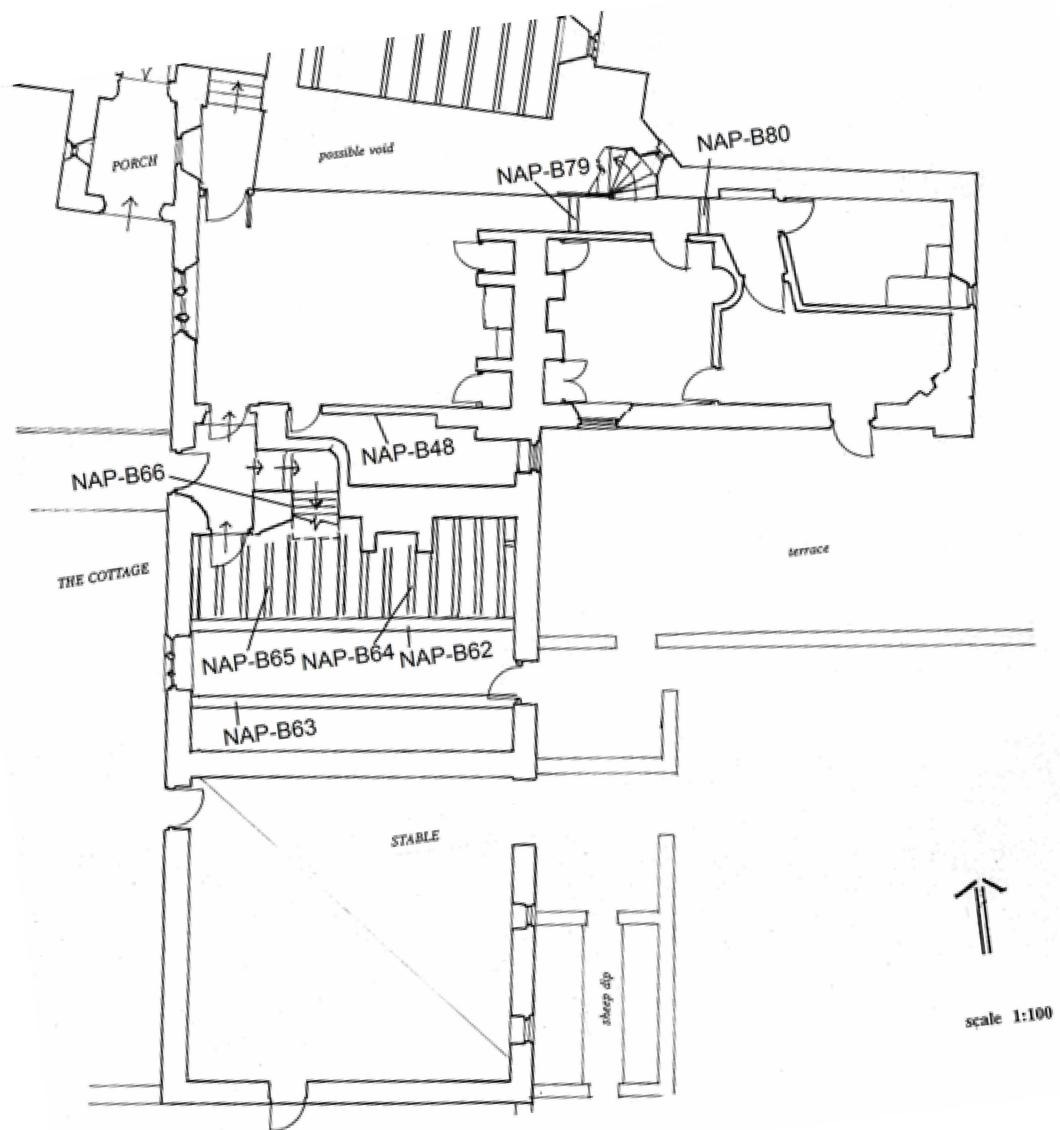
Service range and east wing, ground-floor plan showing the location of samples
